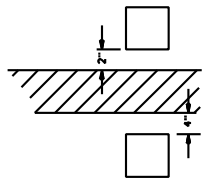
DETAIL A LATERAL PLACEMENT OF PAVEMENT MARKERS
